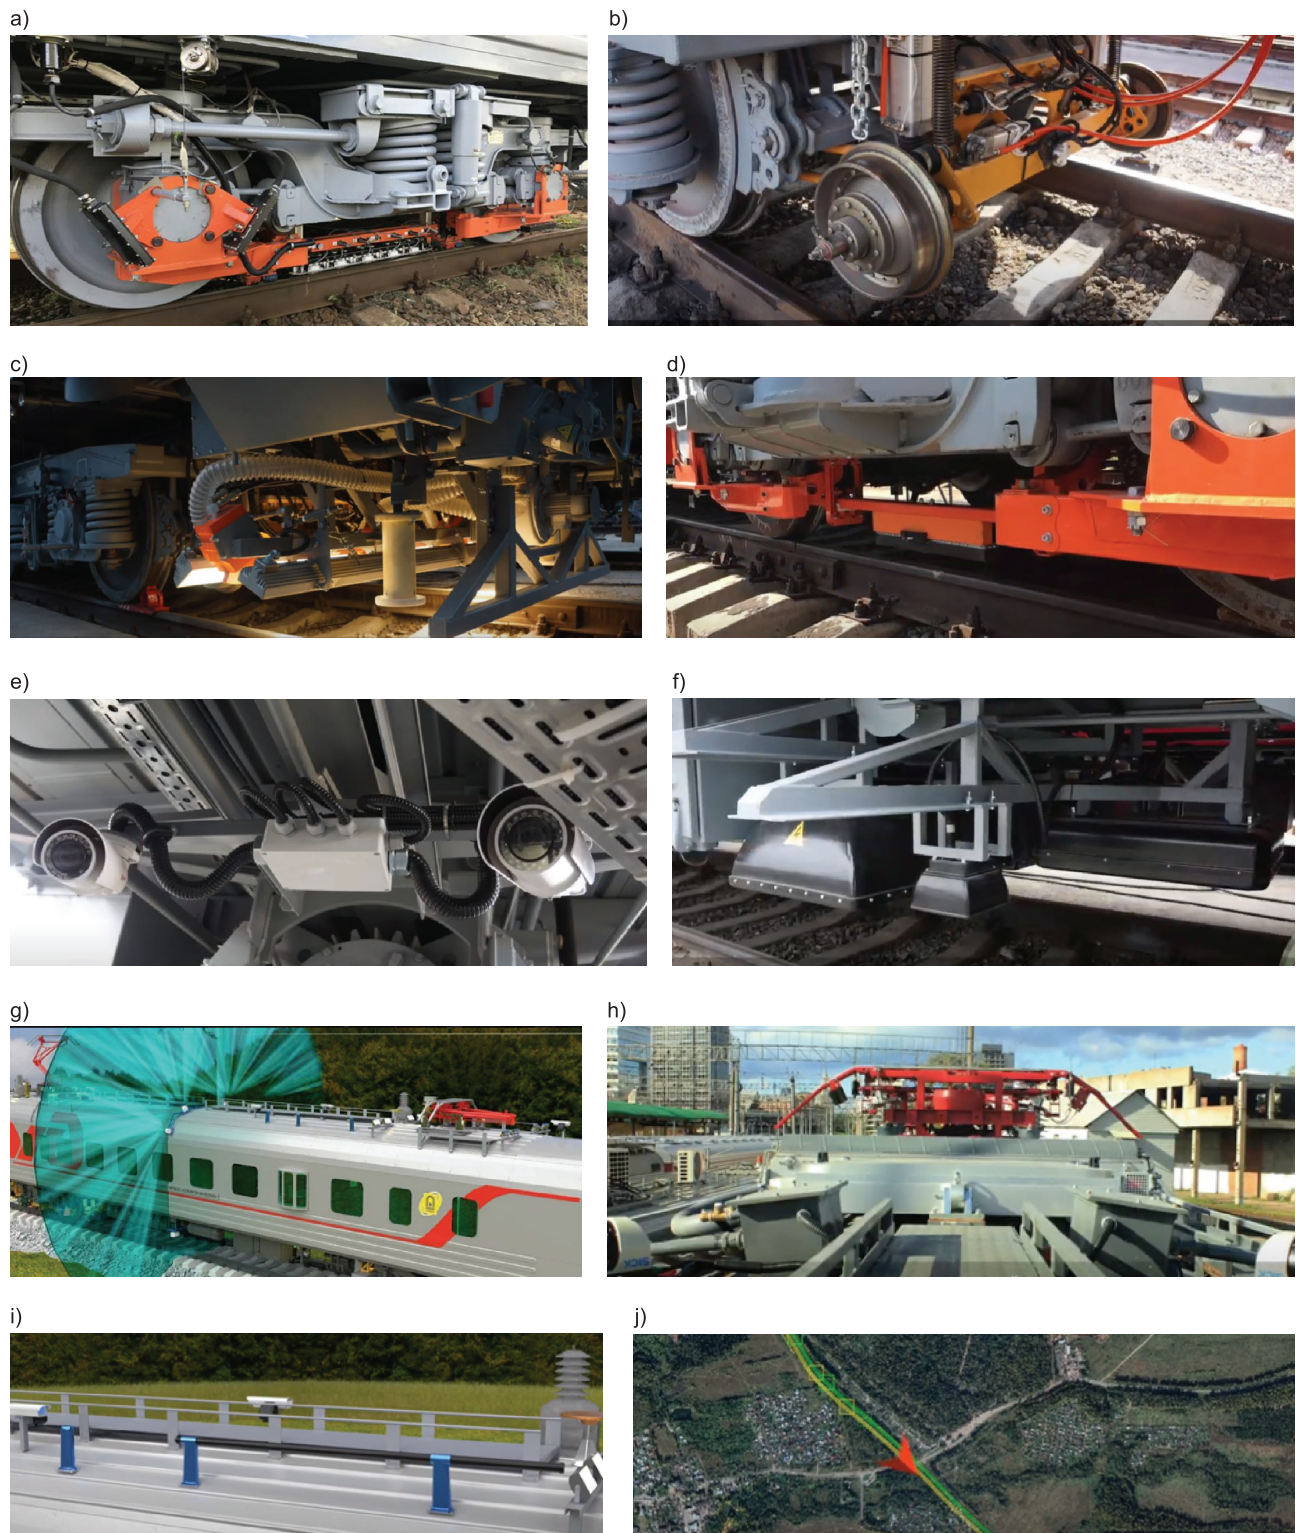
Examples of measurement and control equipment of the SPRINTER INTEGRAL car [4, 9]: a) The device for testing internal rail defects, b) Piece of equipment for checking track gauge and geometry, c) Equipment for inspecting track surface and detecting missing elements, d) Rail head wear detection system equipment, e) Track video surveillance system equipment, f) GPR for rapid assessment of lower track structure condition, g) Infrastructure spatial scanning system in search of elements infringing the structure gauge, h) Overhead contact line parameter control system, i) Control unit for analogue and digital communication networks, j) GPS tracker
